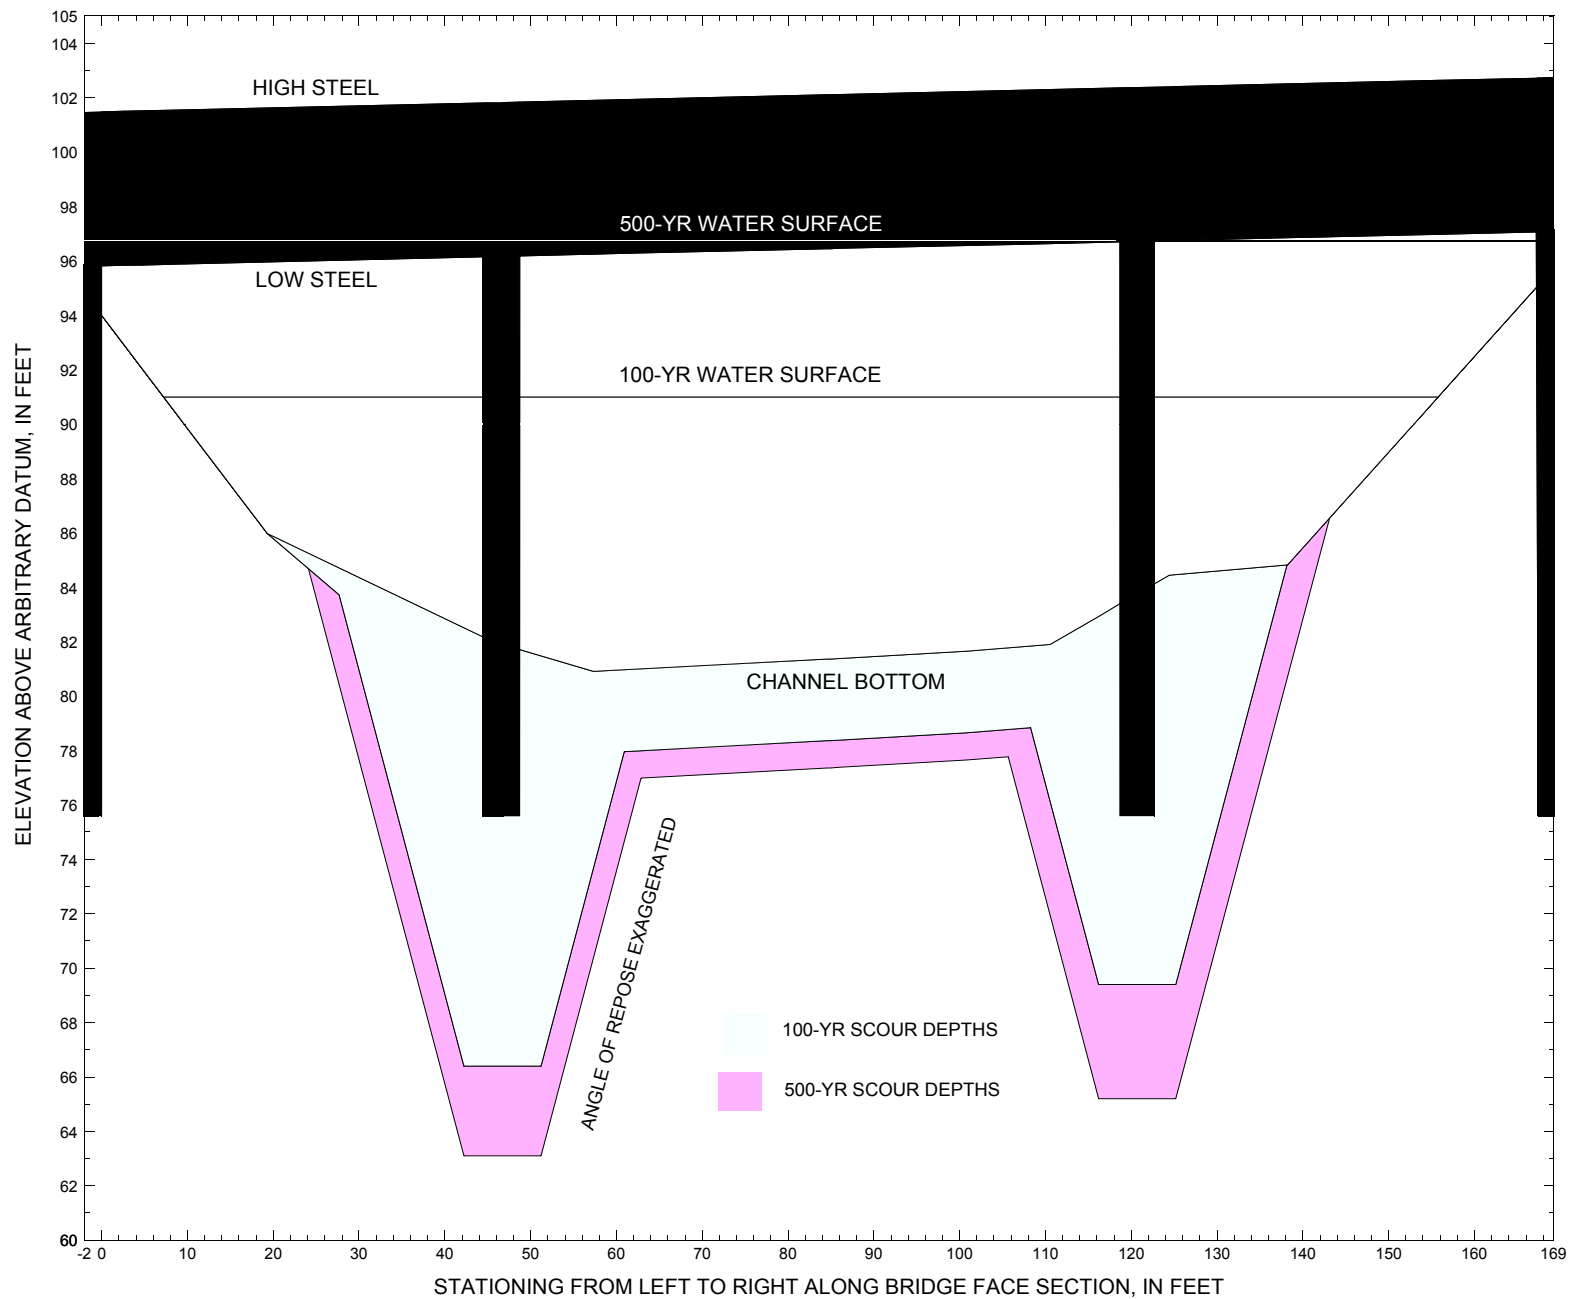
Scour elevations for the 100-yr and 500-yr discharges at structure [BRIDUS00040045a](#) on U.S. Route 4, crossing the [Ottauquehee River, Bridgewater, Vermont](#).
